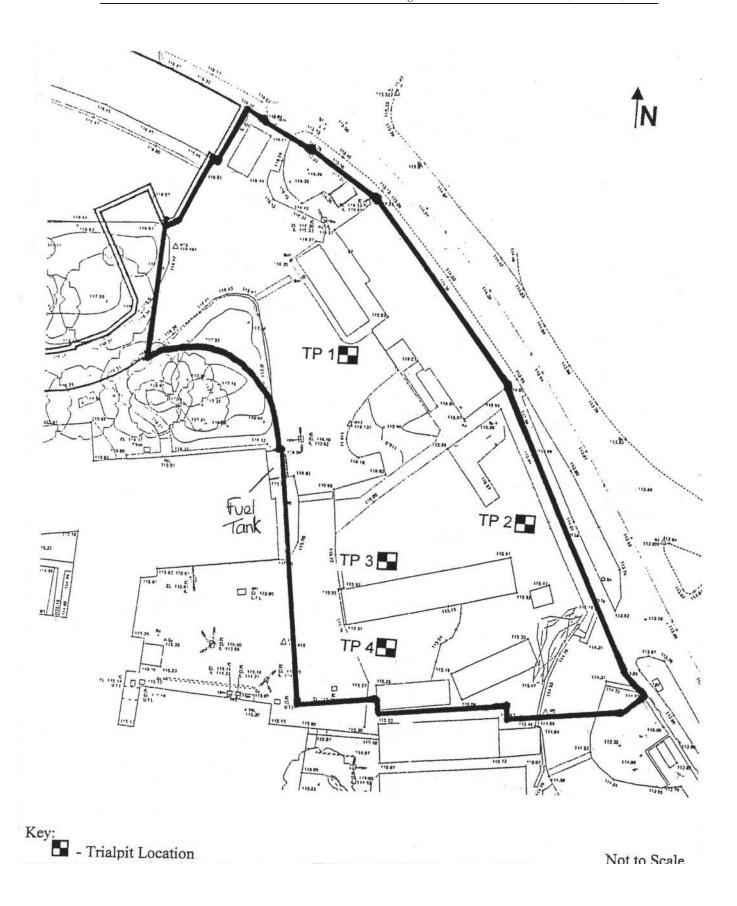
Location of Geotechnical trial pits. (Nicholls Colton Geotechnical)
